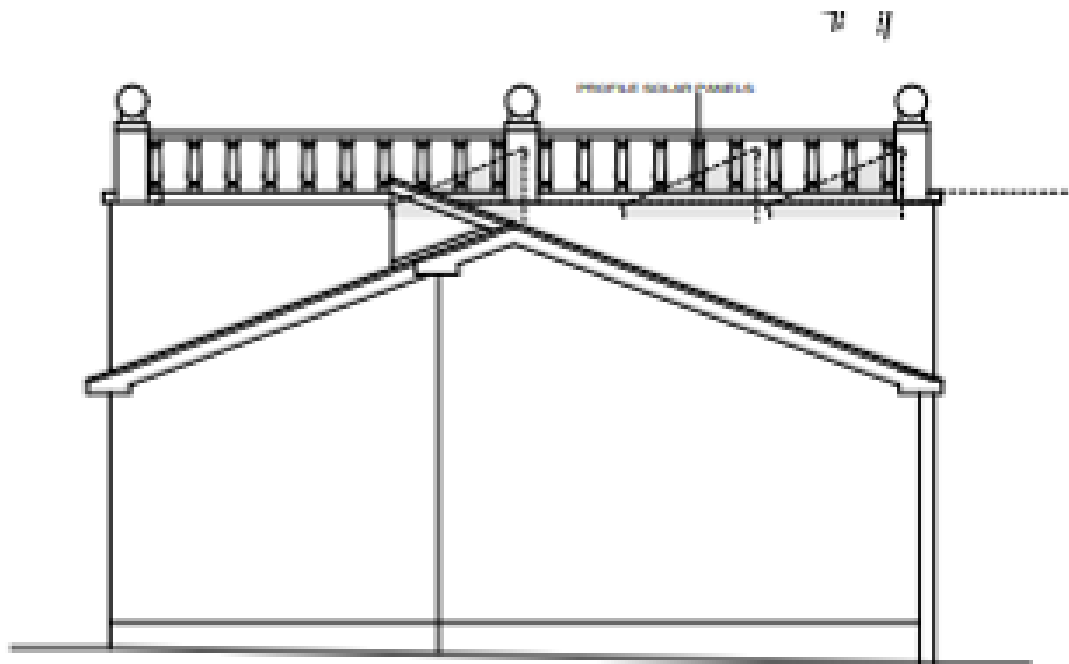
East flank elevation showing solar panels behind parapet roof. Flats in Mulbarton Court located directly behind this elevation.
